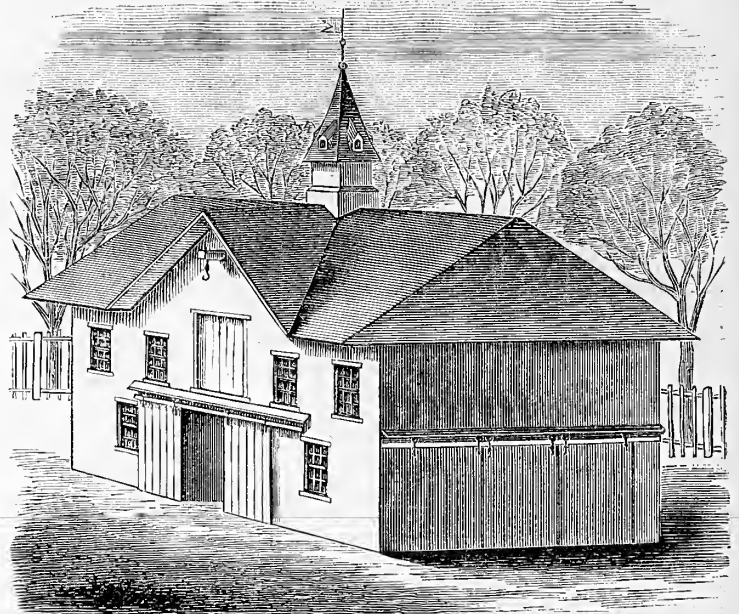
VIEW OF COMBINED WAGON AND TOOL HOUSE.
